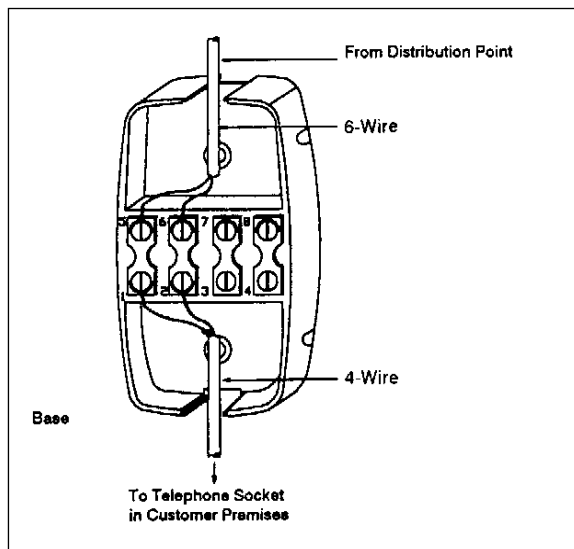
Termination of cables onto 2-pair Screw Type BT
